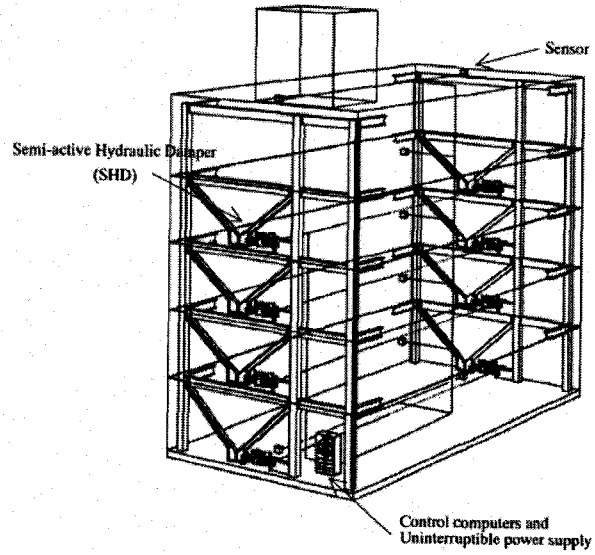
Kajima Shizuoka Building equipped with semi-active hydraulic dampers
